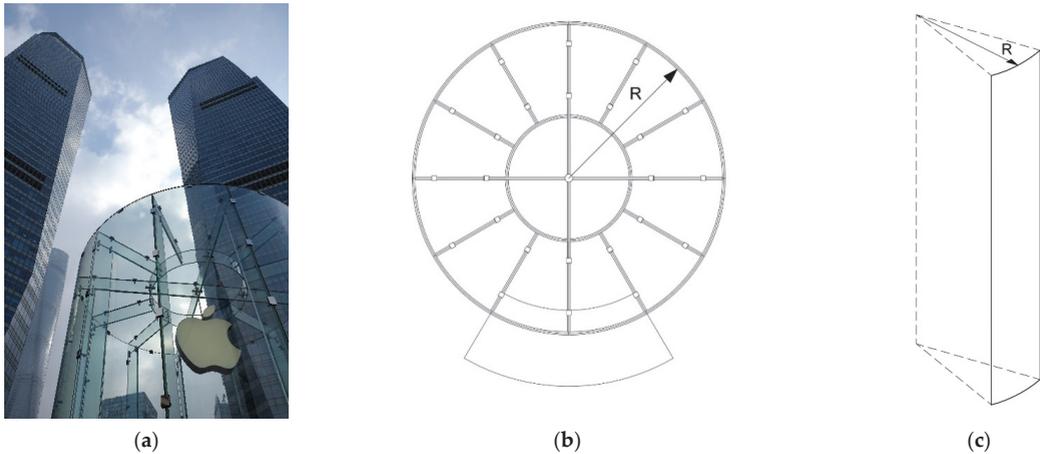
The Apple Retail Store in Shanghai Pudong: (a) view of the transparent pavilion (WikimediaCommons/Kallera/CC-BY-S-4.0); (b) roof plan (figure by the author); (c) shape of the glass pane (figure by the author).
